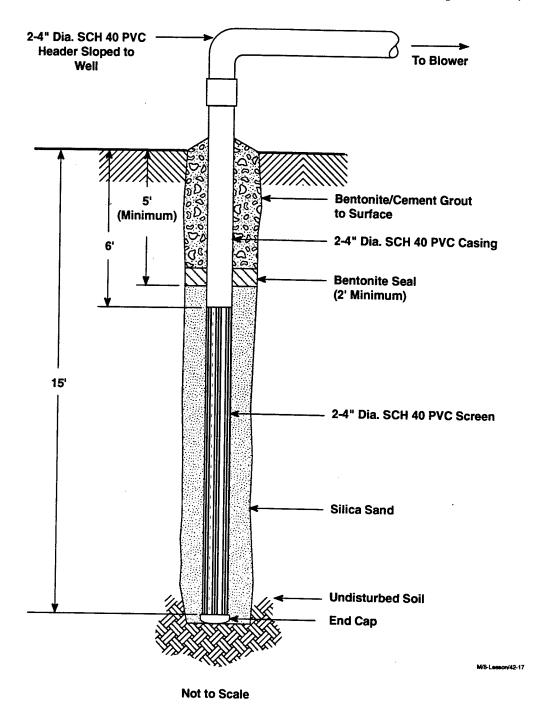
Schematic Diagram of a Typical Vent Well Construction
